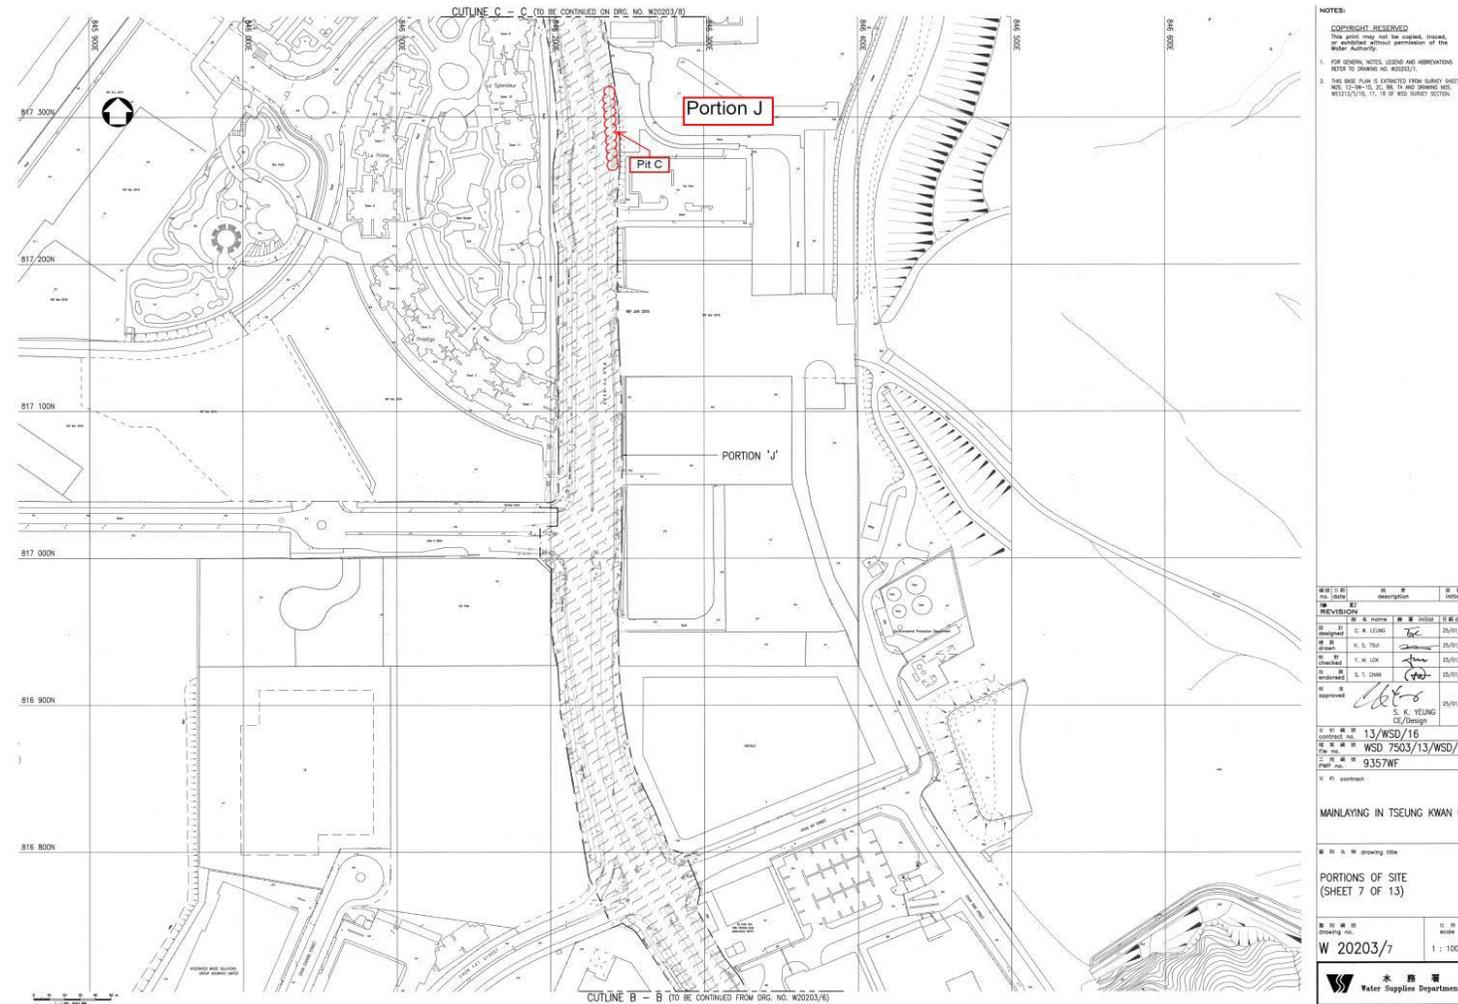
Location Plan for Portion J – CH.A 19+15 to CH.A 19+50 (Pit C)
